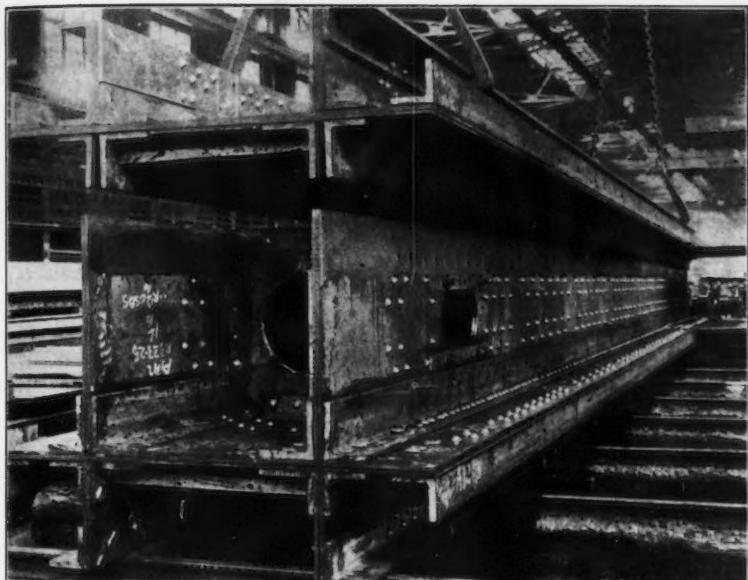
FINAL FITTING OPERATION ON TYPICAL TOWER COLUMN SECTION.
